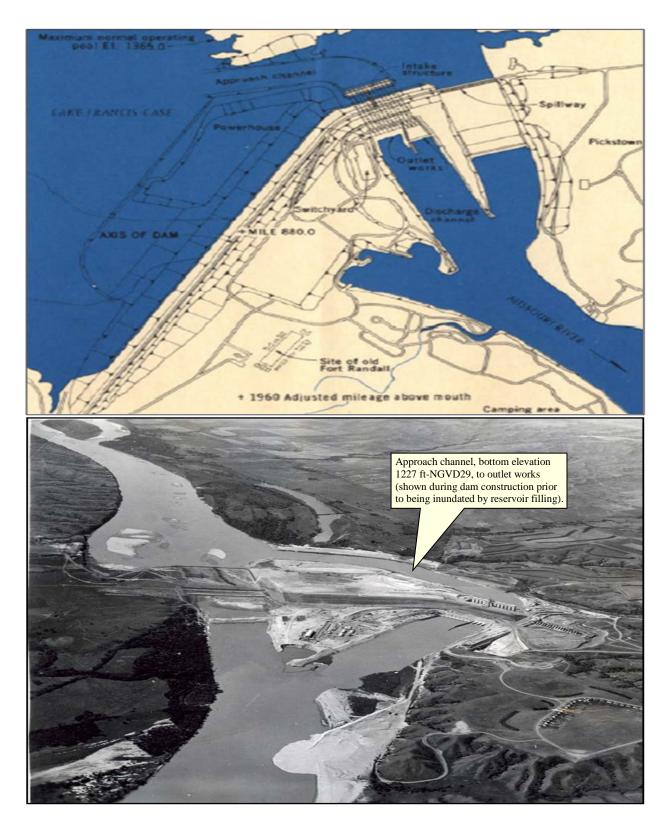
Schematic drawing and photo of outlet works at Fort Randall Dam.
